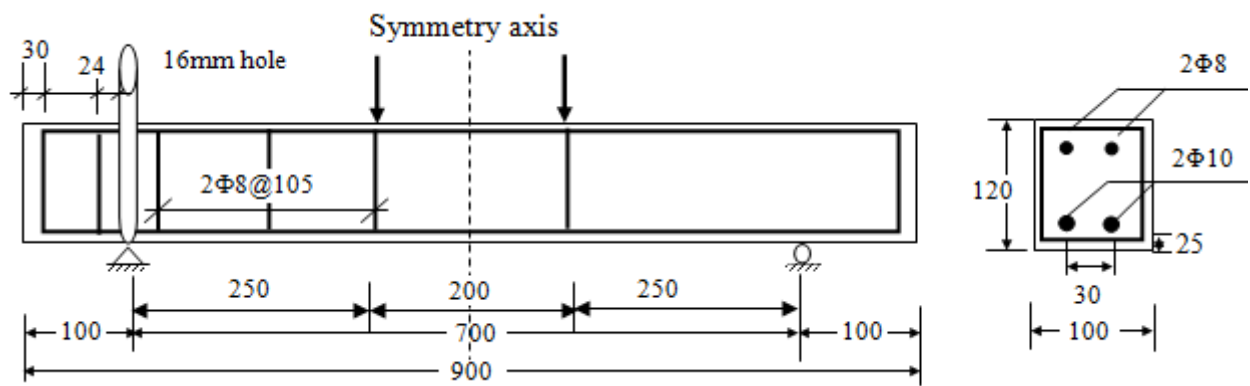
Sketch of RC beam specimen (all dimensions are mm).
